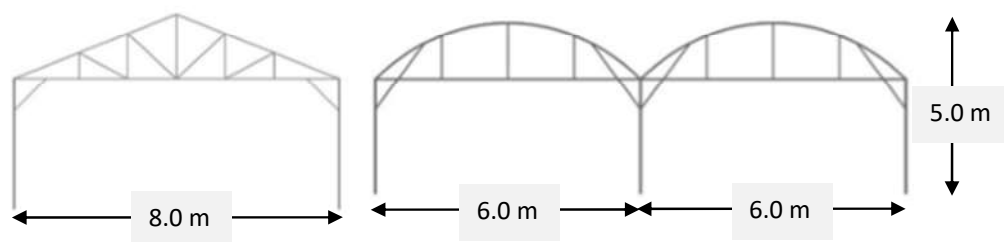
Duopitch and arched roofs reinforced with trusses.
